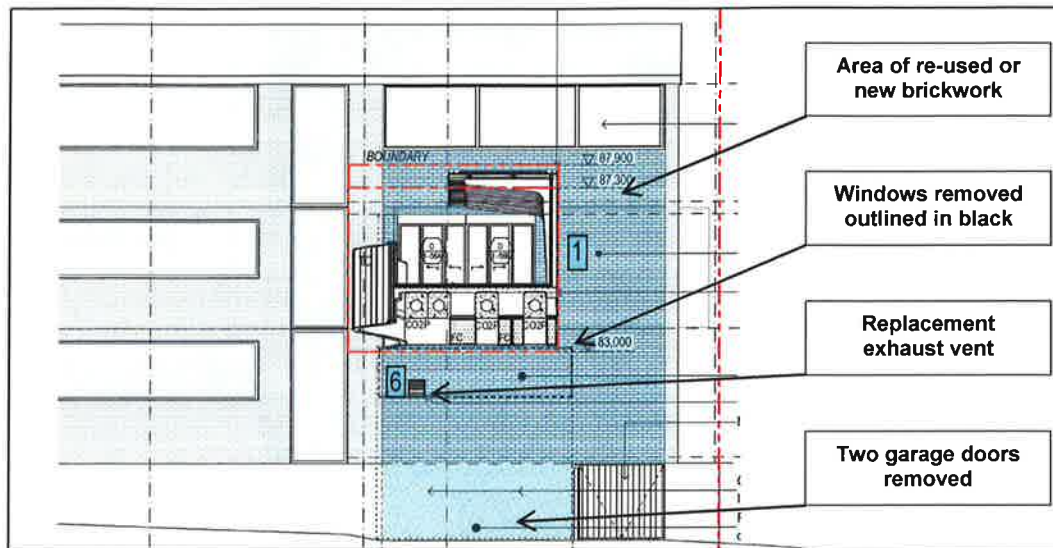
Judith Dey Wing elevation (source: Application documents, 2018)
